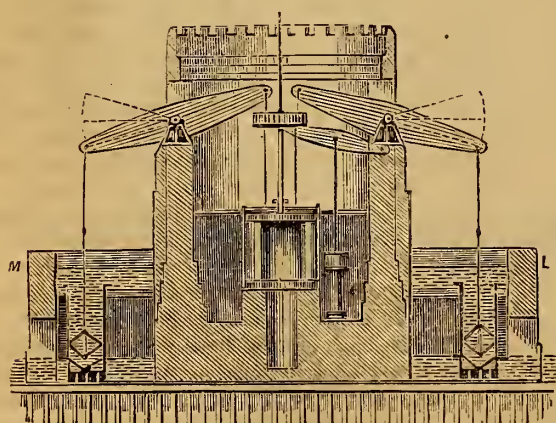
Sectional Elevation of Engine-house and Pumps.
